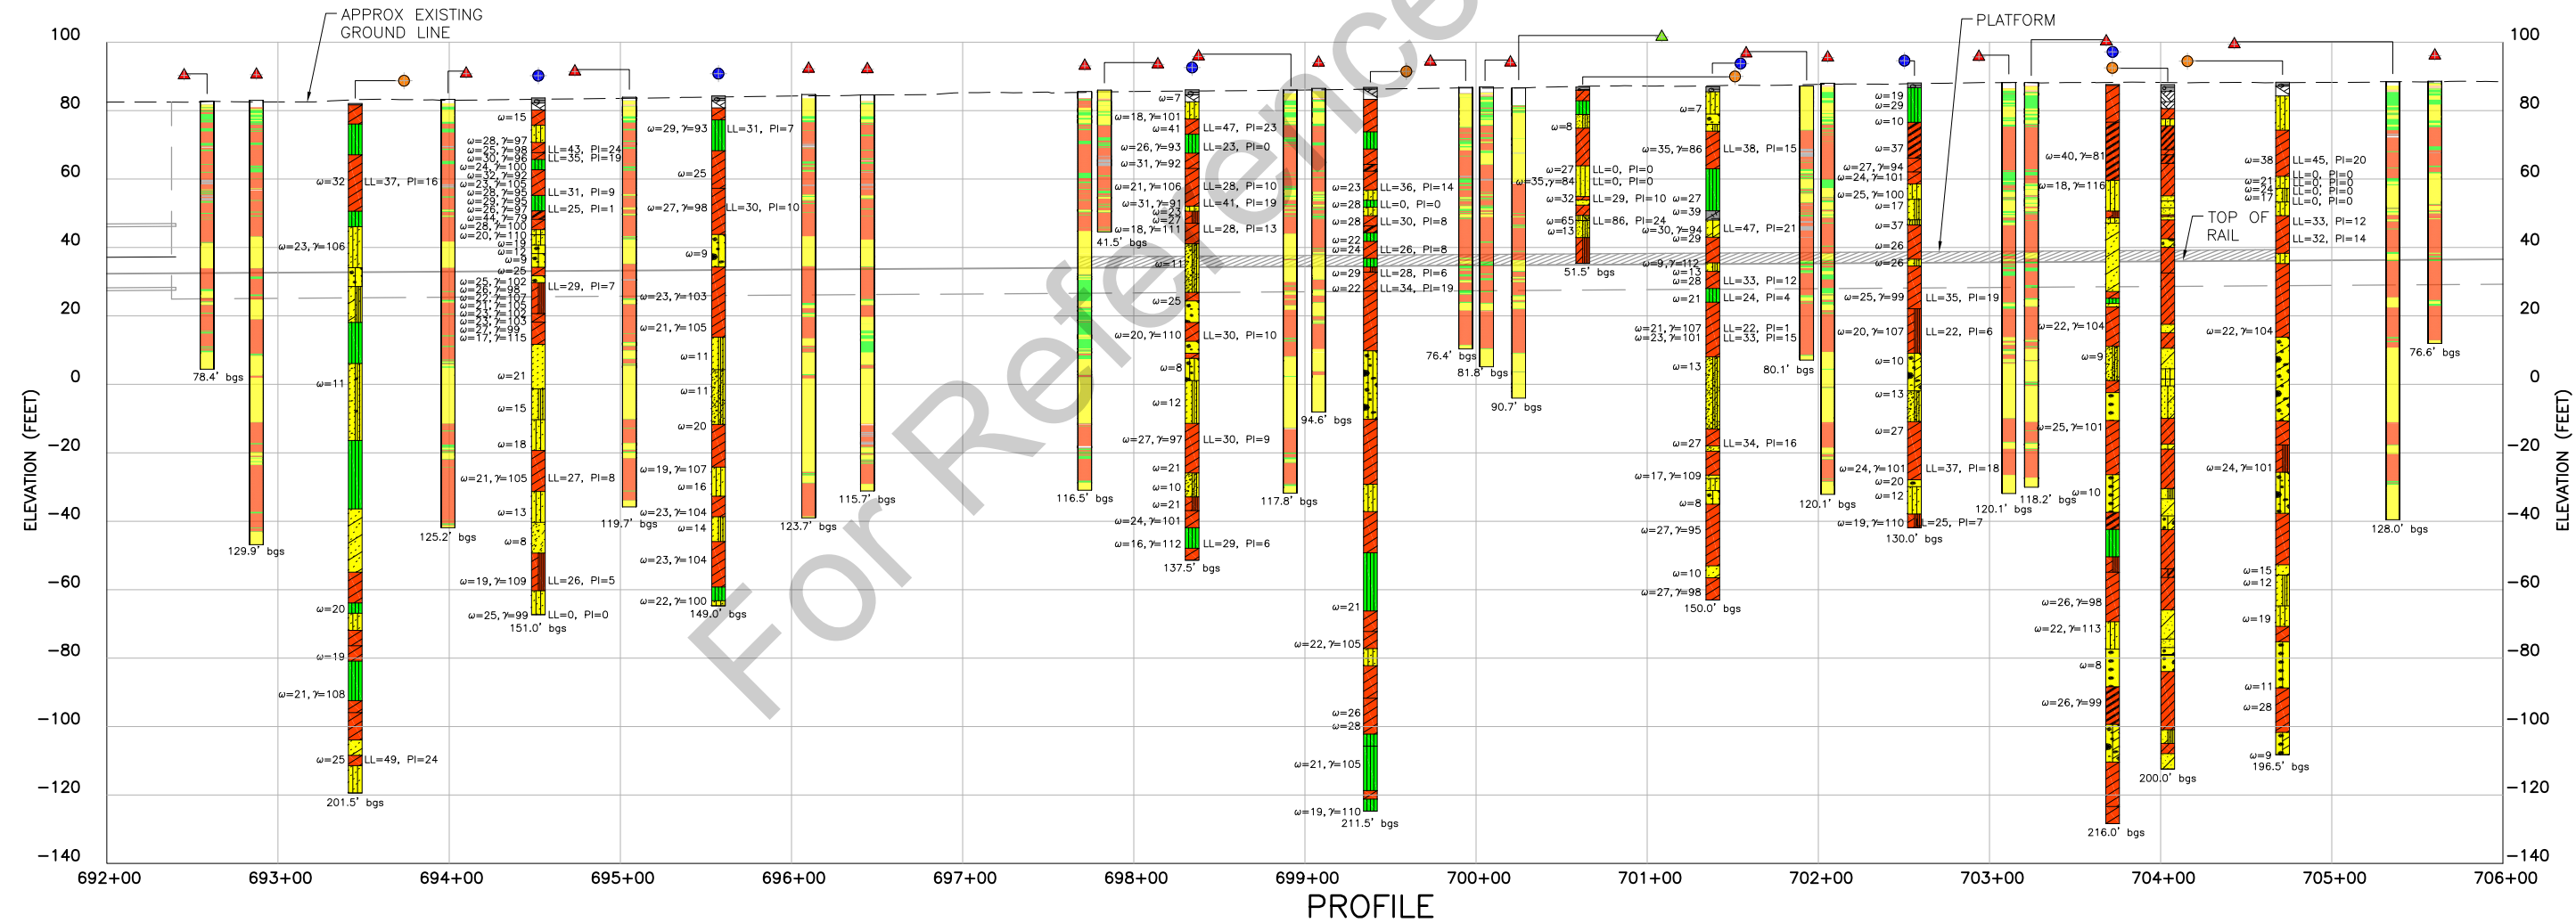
Geotechnical Plan and Profile with Classification Test
